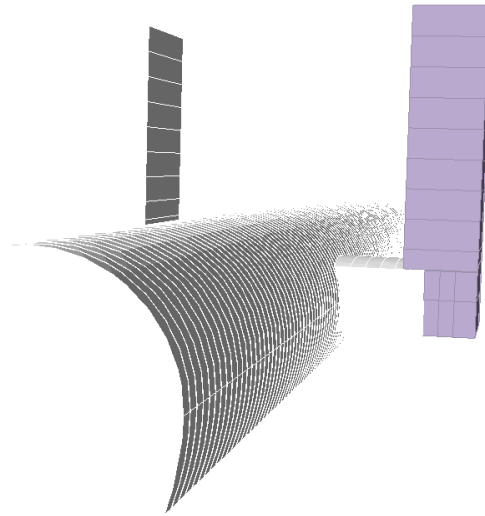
Example of the top heading & bench excavation for the cross-passage type (b) at stage 257
